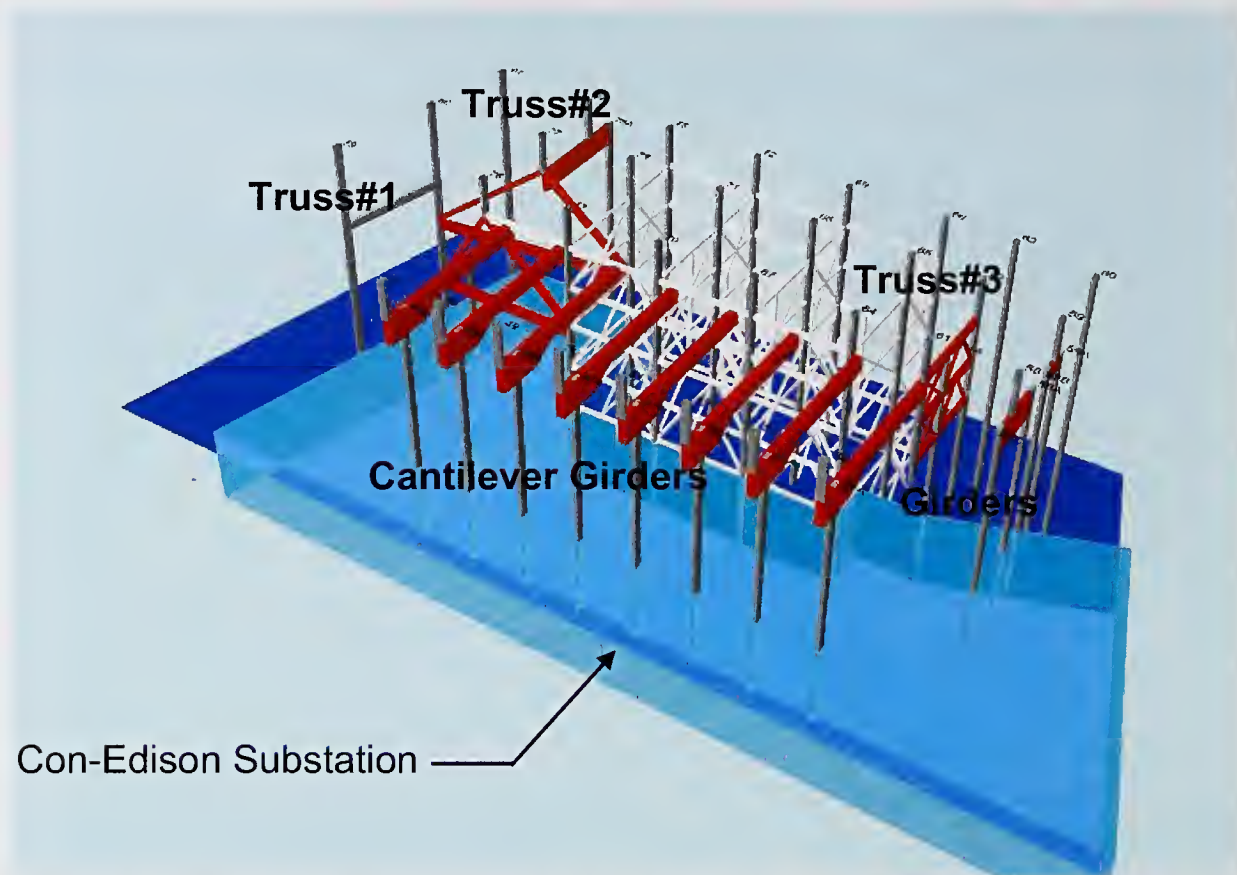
Transfer trusses and girders between the fifth and seventh floors.
